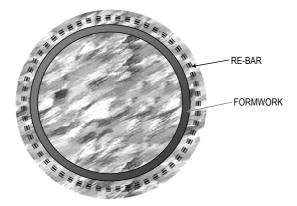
A section of the circular reinforcement mesh for the caisson lining.
